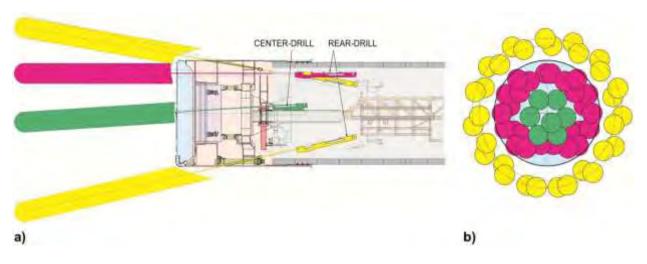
General arrangement of the drilling pattern for pre-grouting (Hallandsås Tunnel, Sweden) [16]): *a) longitudinal section; b) cross-section.
